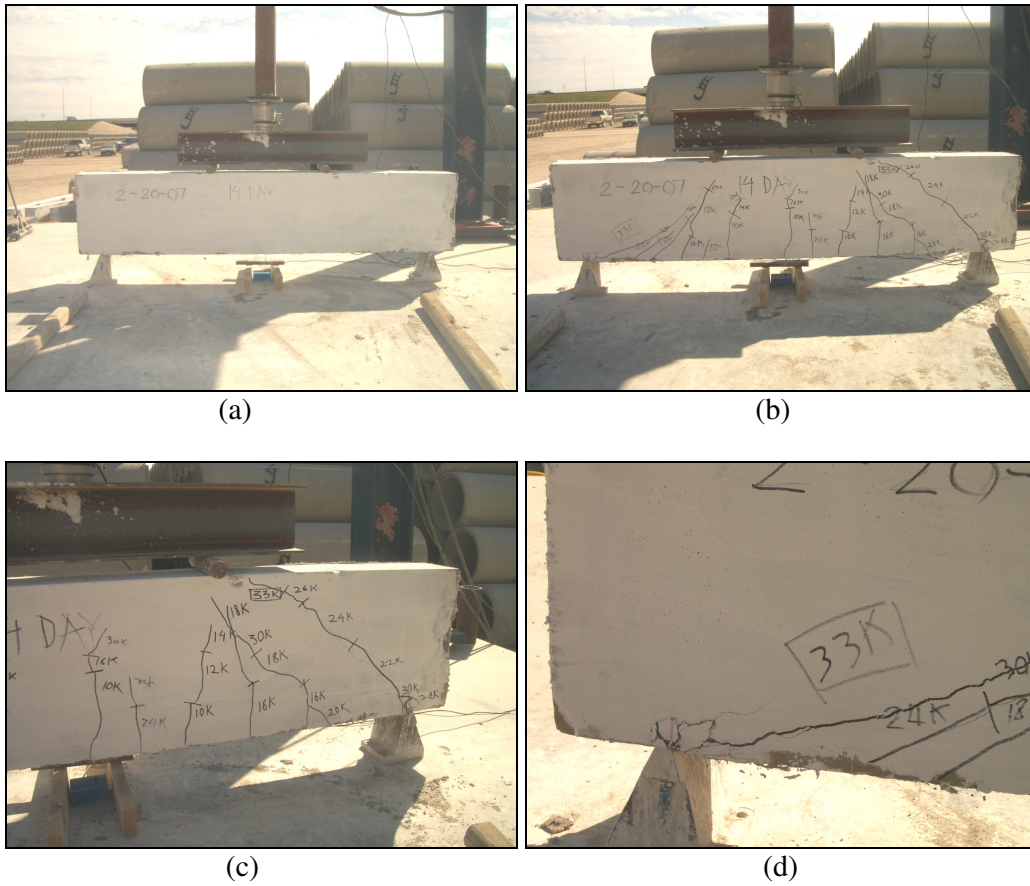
Ductile lightweight concrete beam with reinforcement cast on 2/27/07 for 14 day test; (a) before test, (b), (c), and (d) cracks on the beam after test
